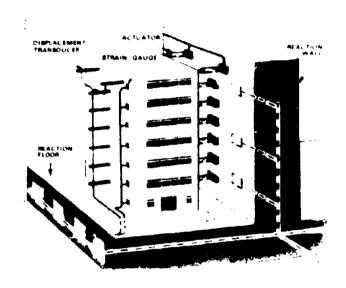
The Building Research Institute in Tsukuba, Japan, has a 25-m-high reaction wall test facility. Tests have been carried out on a full-scale seven-story reinforced concrete building, constructed next to the large reinforced concrete reaction wall. Hydraulic jacks at each floor of the building produced forces by reacting against the wall. The forces exerted by the jacks produced earthquake-like deformations in the building, as controlled by a computer. The magnitude of the resulting forces and deformations were transmitted back to the computer for analysis. The entire facility is housed in a large building. Related laboratories are housed in adjacent buildings.
